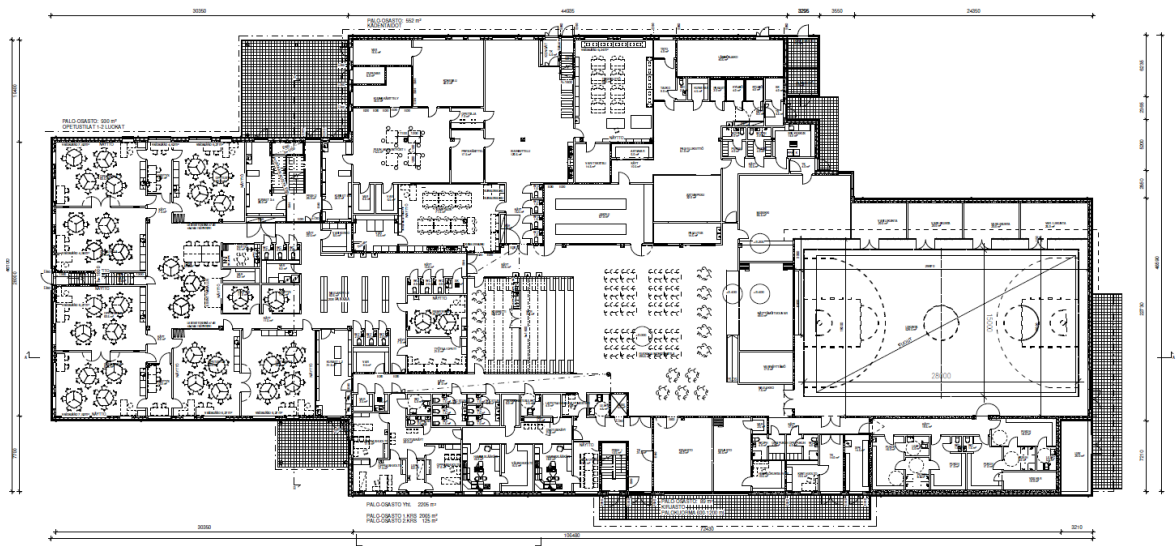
Floorplan of the first floor retrieved from the project bank 2020.
